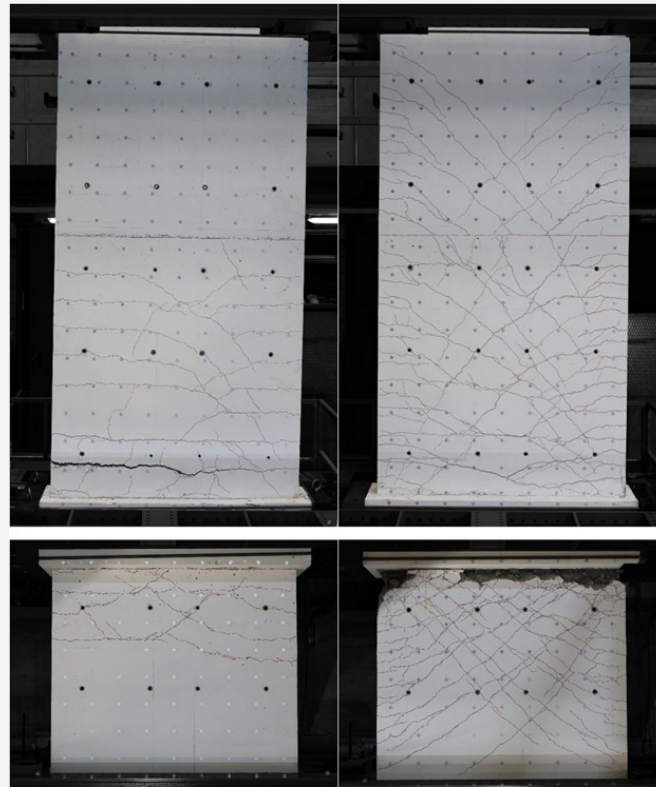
Crack patterns after completion of the experiment: a) Wall 1 b) Wall 2.
